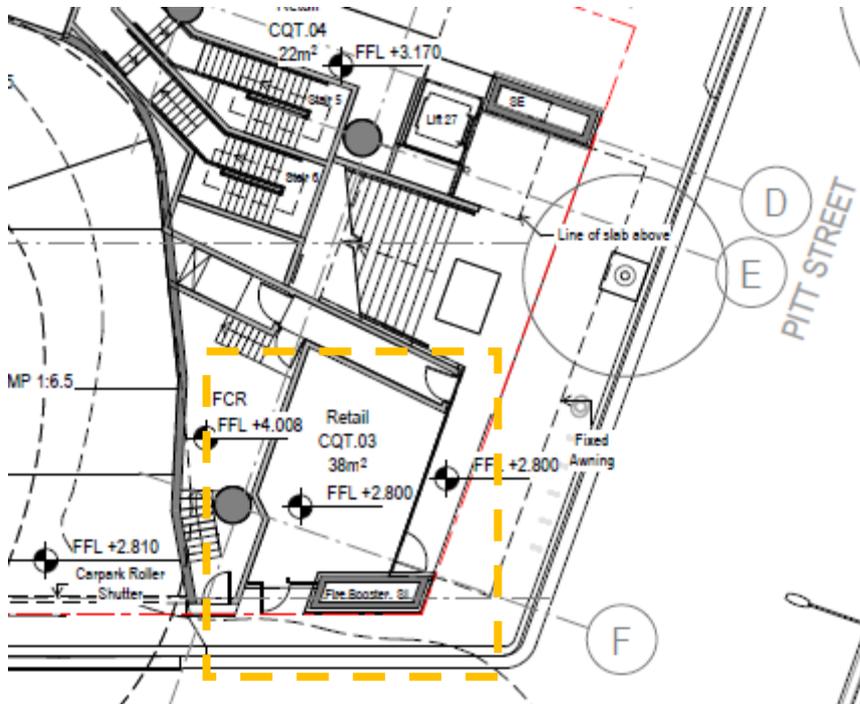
Retail to corner of Pitt Street and Underwood Street.
